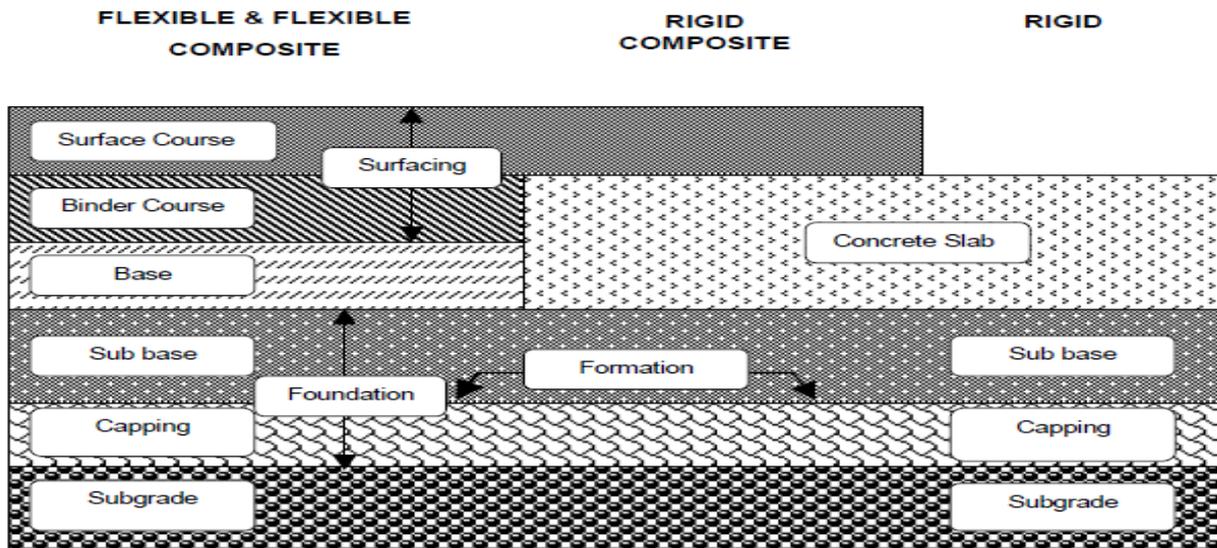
Different Pavements and Their Foundations (Wanab, Y. 2005)
